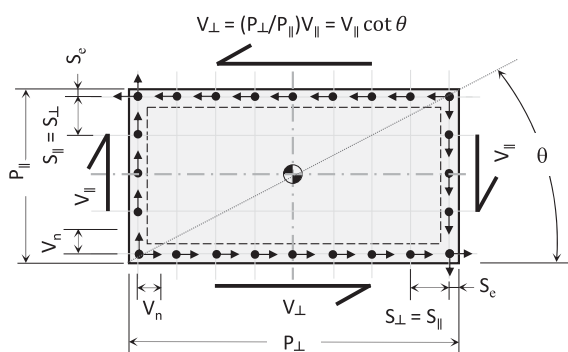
Panel dimensions, fastener spacings, and shear forces.
